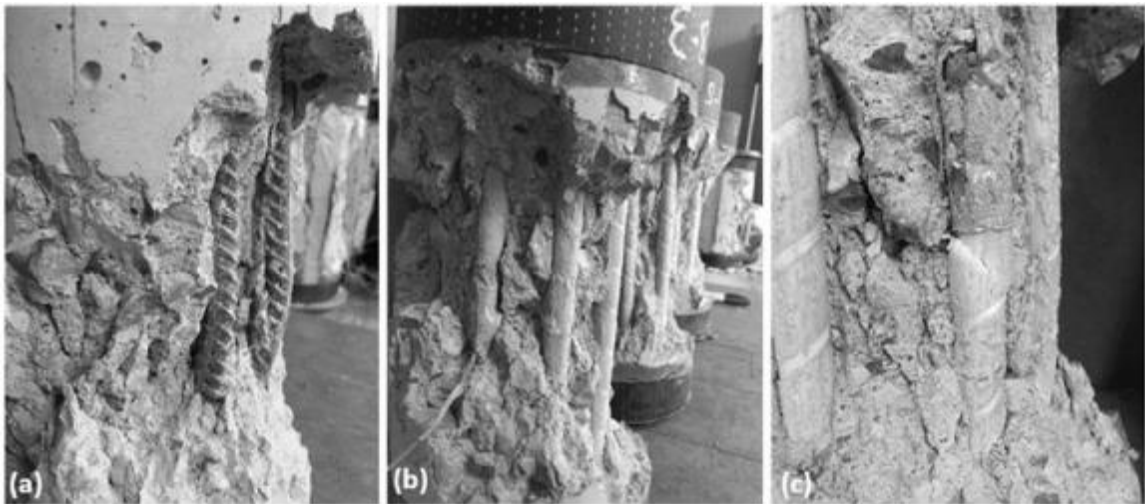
Concrete cylinder failure modes (a) Steel rebar inelastic buckling (b) GFRP rebar elastic buckling (c) GFRP rebar crushing (Fillmore and Sadeghian 2018)
